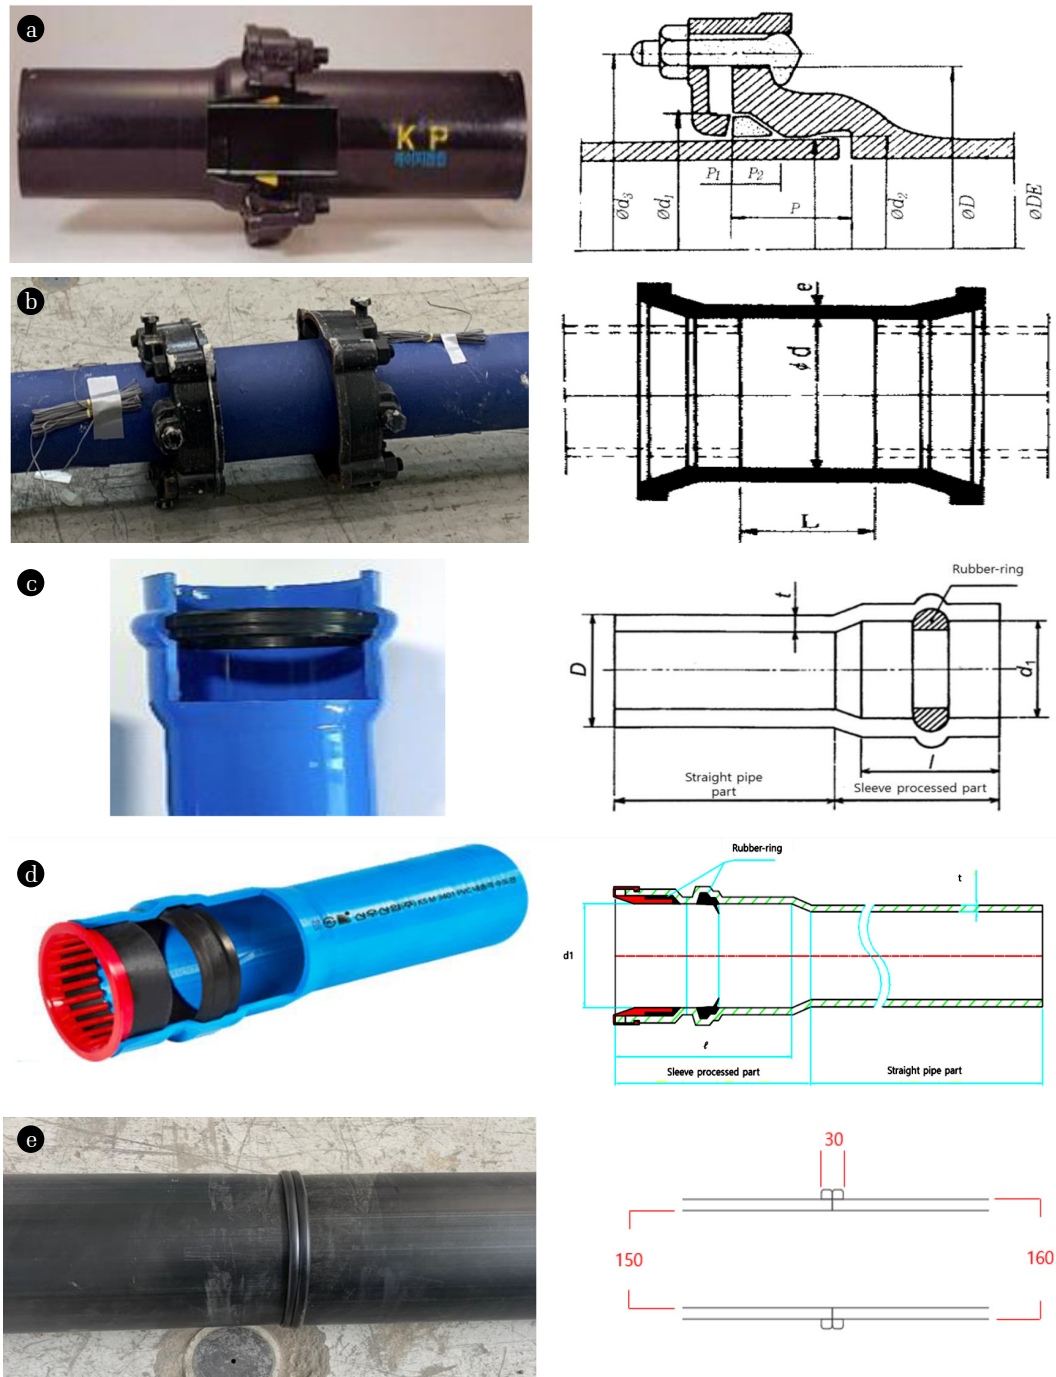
Description of each test specimen. a: Test specimen No.1 (DCIP_KP mechanical joint); b: Test specimen No.2 (DCIP_Collar connection joint); c: Test specimen No.3 (HI-VP_Socket joint with one rubber-ring); d: Test specimen No.4 (HI-VP_Socket joint with two rubber-ring); e: Test specimen No.5 (HDPE_Fusion bonding).
